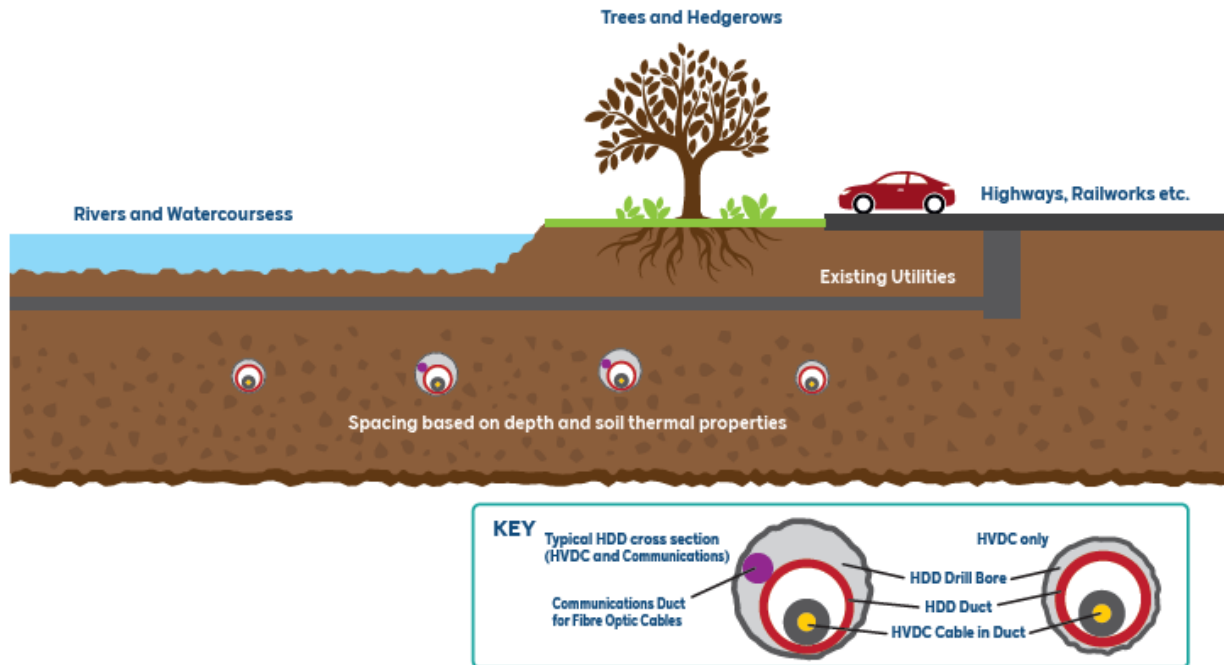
Trenchless Crossing e.g. HDD beneath roads rivers or other infrastructure
